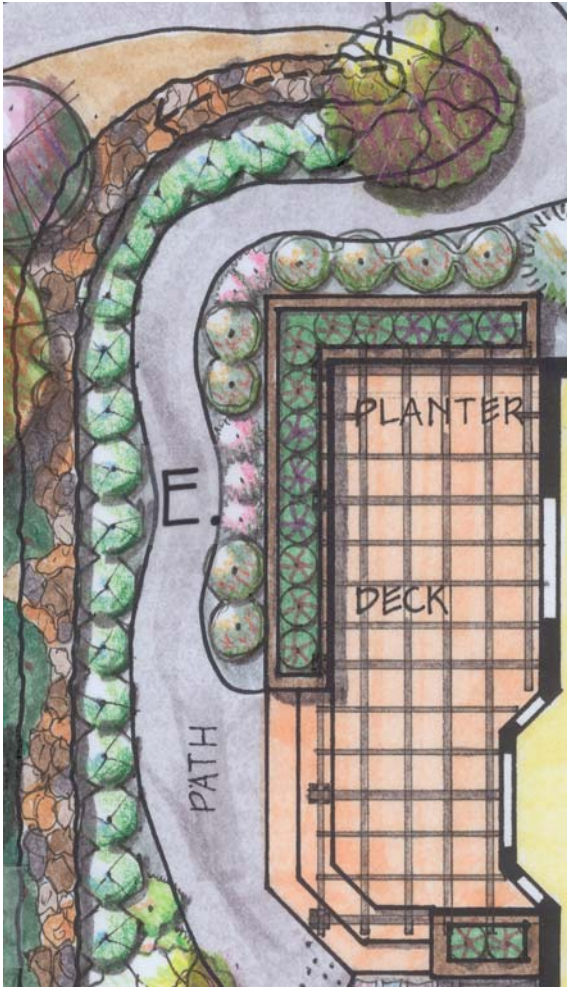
and 3.19 Patio Garden rendering and planting plan for the original design
